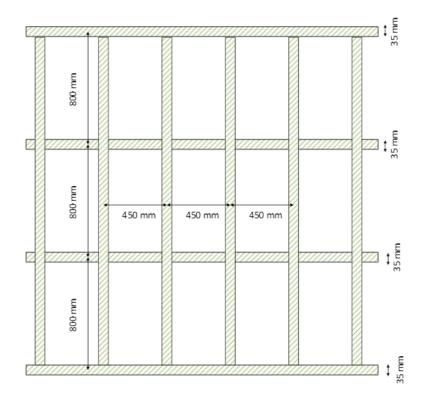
BRICK VENEER TIMBER FRAME ELEVATION PROFILE
